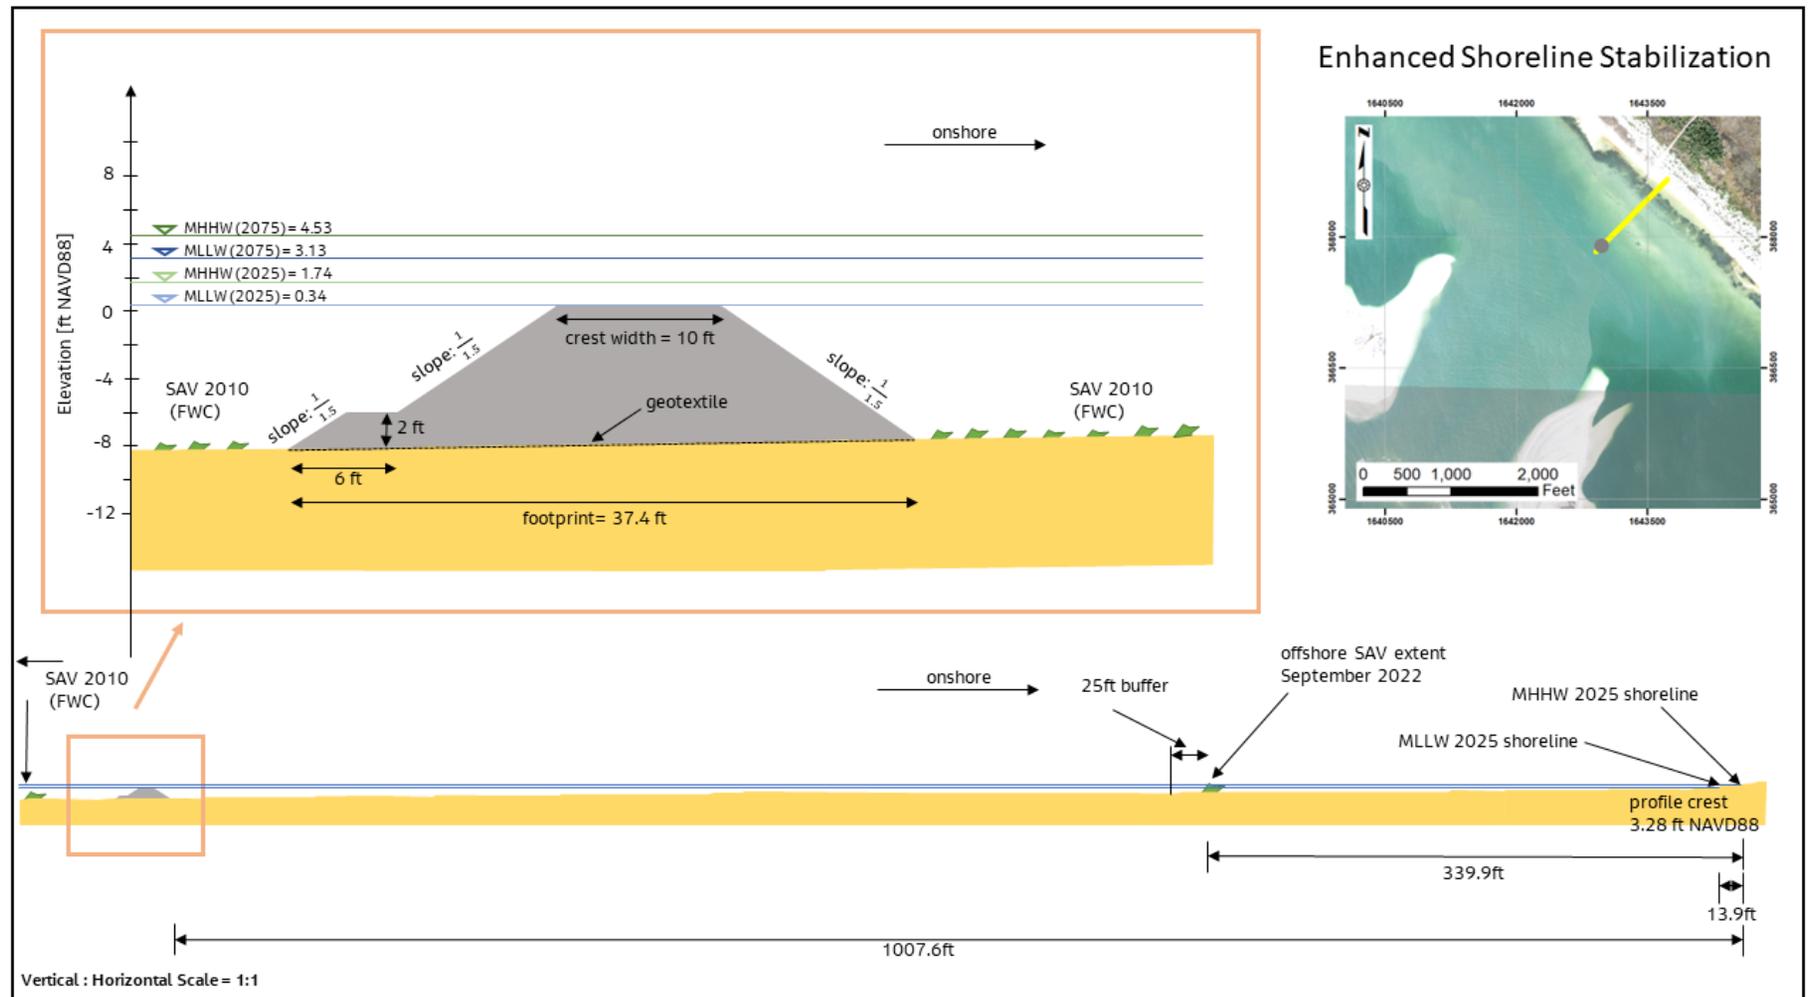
Submerged Rubble Mound Breakwater without Toe with a Crest Width of 10 feet and a Crest Elevation at MLLW 2025
